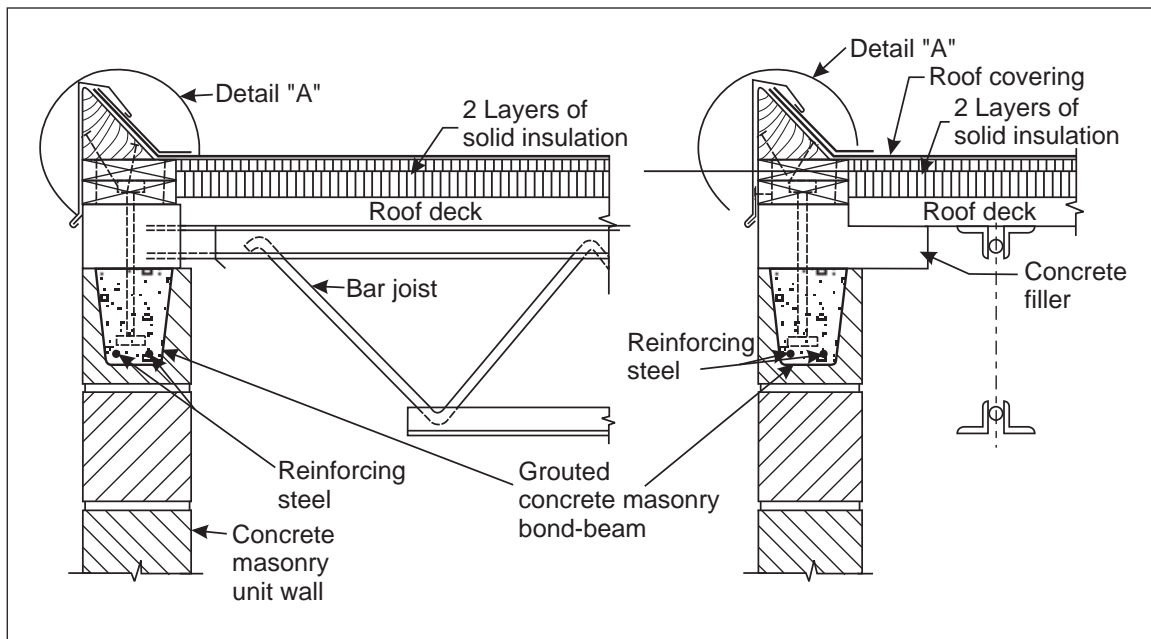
Multi-ply roof cover with perimeter edge flashing detail
